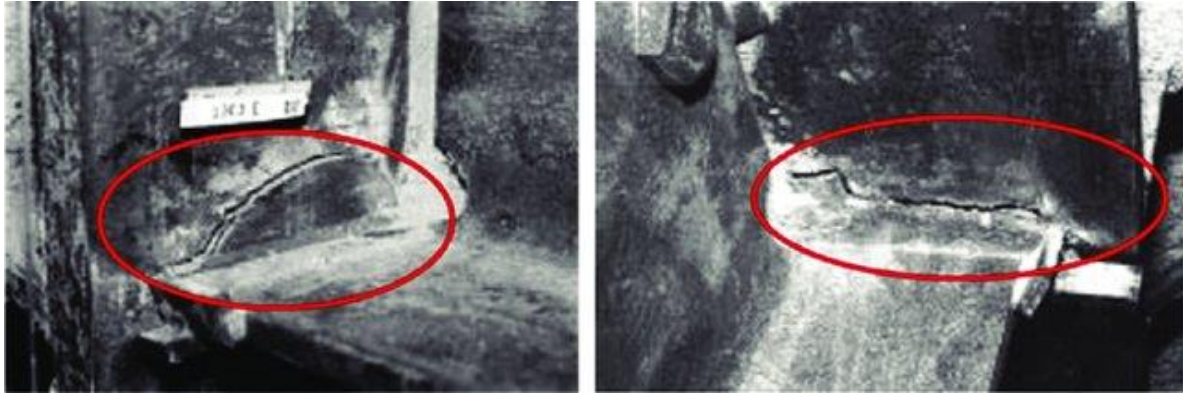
Examples of brittle failure of welded beam-column connections during the 1994[6]
